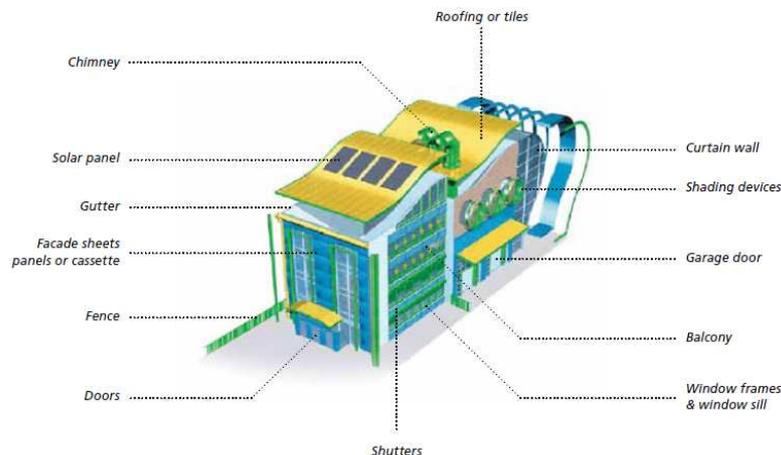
Aluminium building products (<http://www.eaa.net/upl/4/>)
